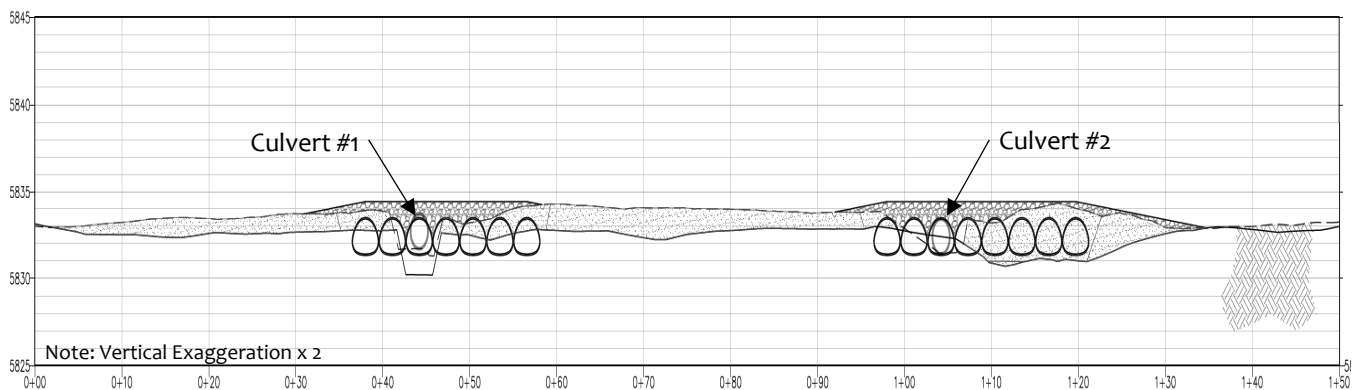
Culvert Replacement Alternative 2 – Small Culverts (15)
